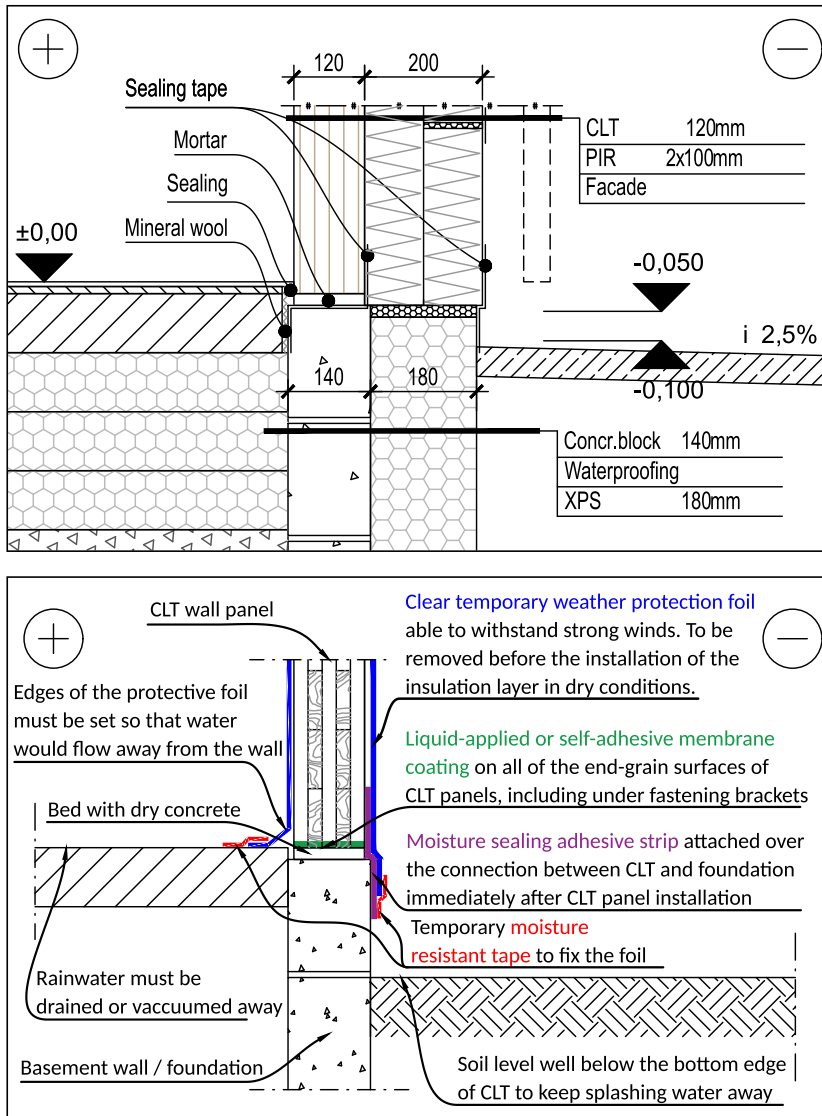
Design drawing (top) of the exterior wall to foundation connection and an example drawing (bottom) of the moisture safety design drawing for the same area.
